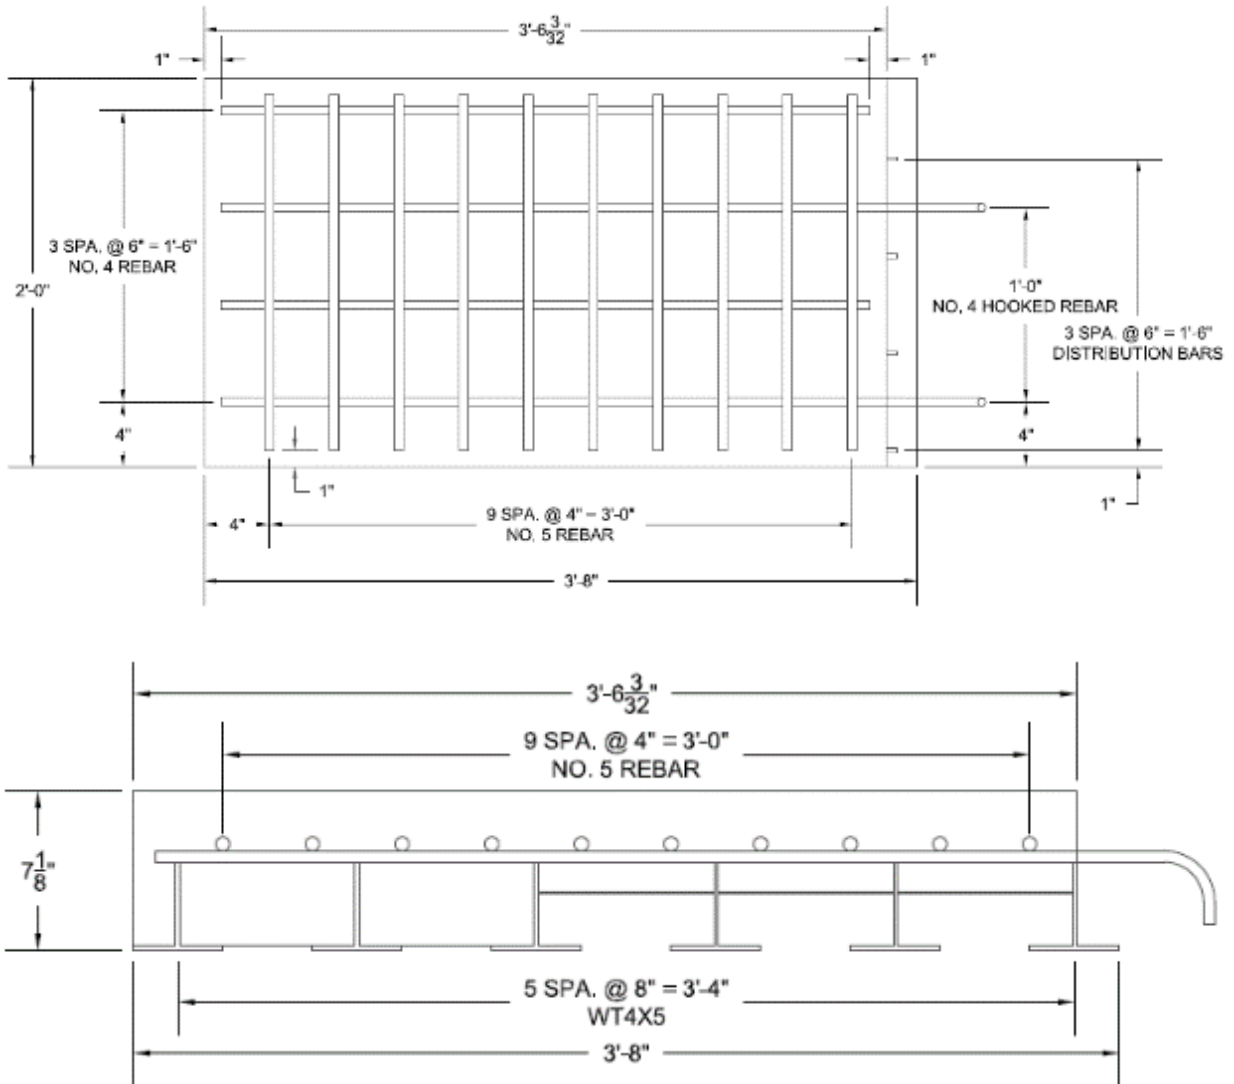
Reinforcing Steel Layout for Staggered Hook Reinforced Panel
